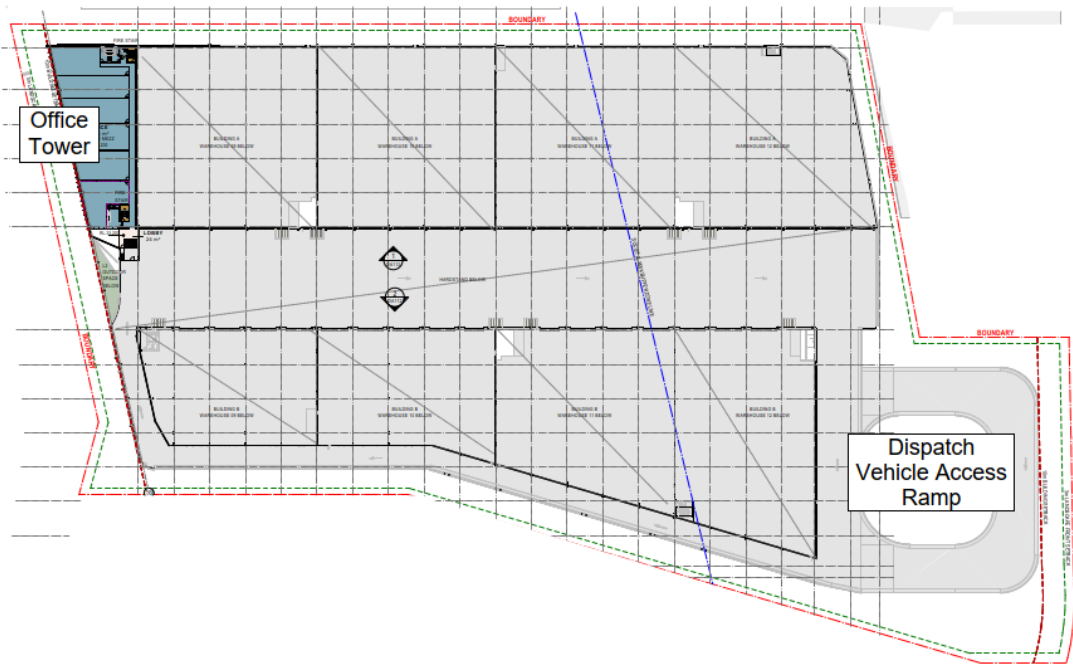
Level 2 Mezzanine (Office) Floor Plan
